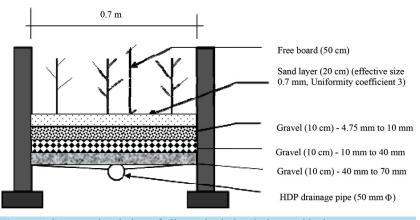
Cross sectional view of pilot scale sludge drying reed bed.
